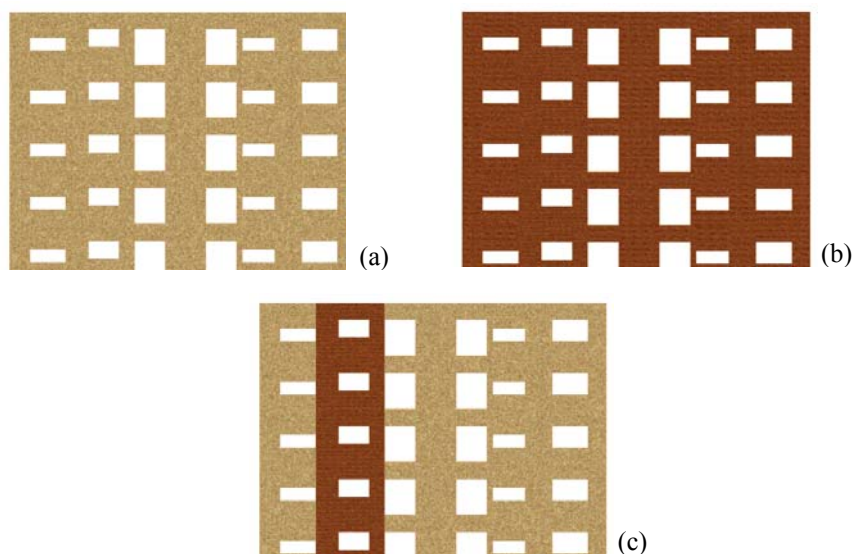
Sections of shear walls stabilized by use of (a) nailed-on sheathing alone, (b) solid timber elements alone and (c) a combination of solid timber elements and nailed-on sheathing.
